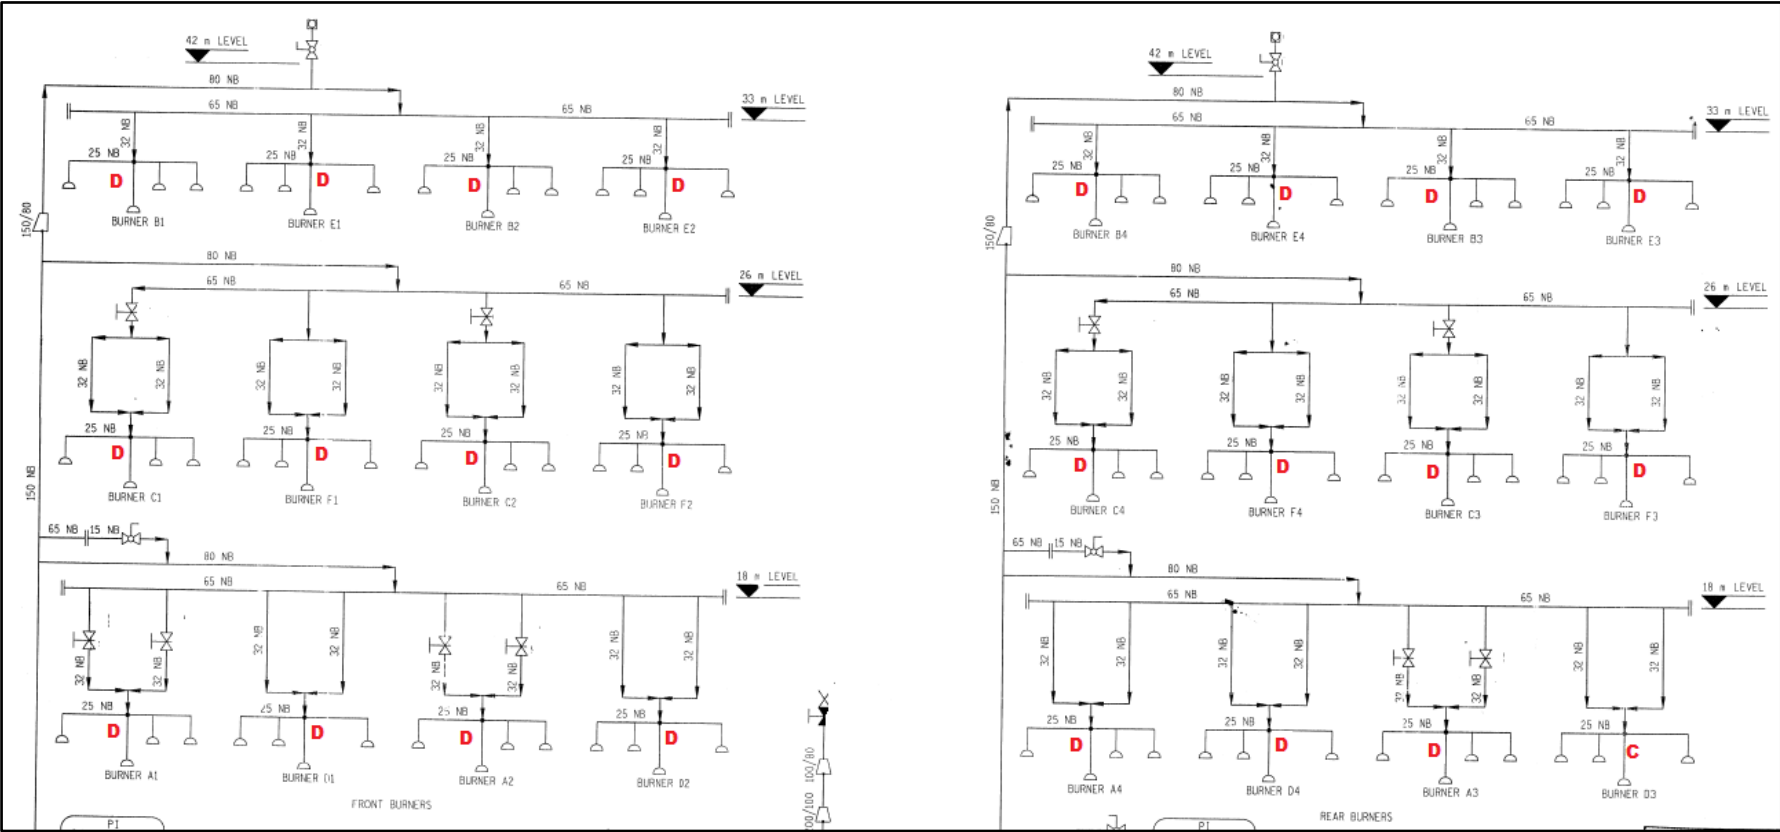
Unit 5 Boiler Burners MJC Locations [55]
